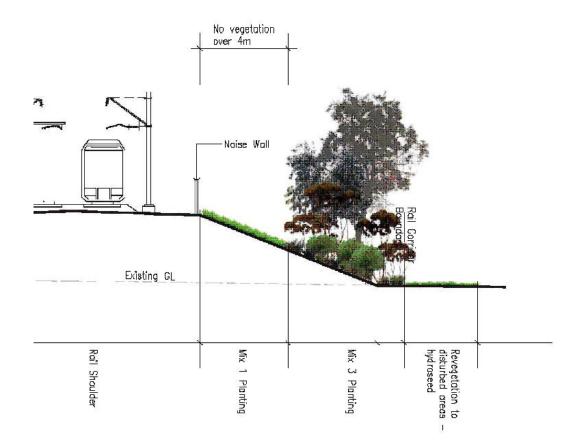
Typical embankment, with fully structured planting acting as a visual barrier
